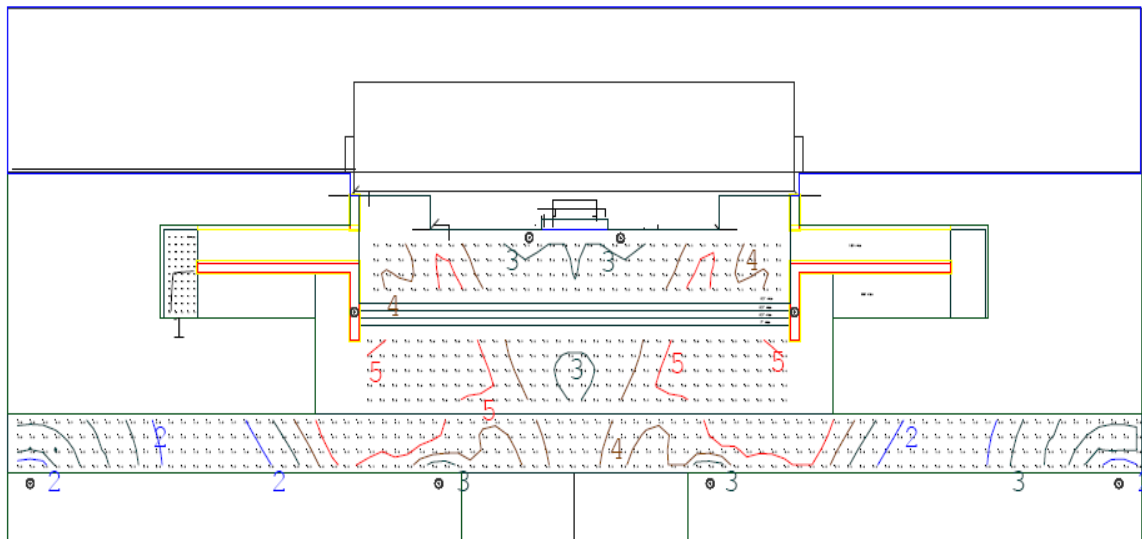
East Entry and Façade – Plan of AGI Model with Footcandle Isolines
